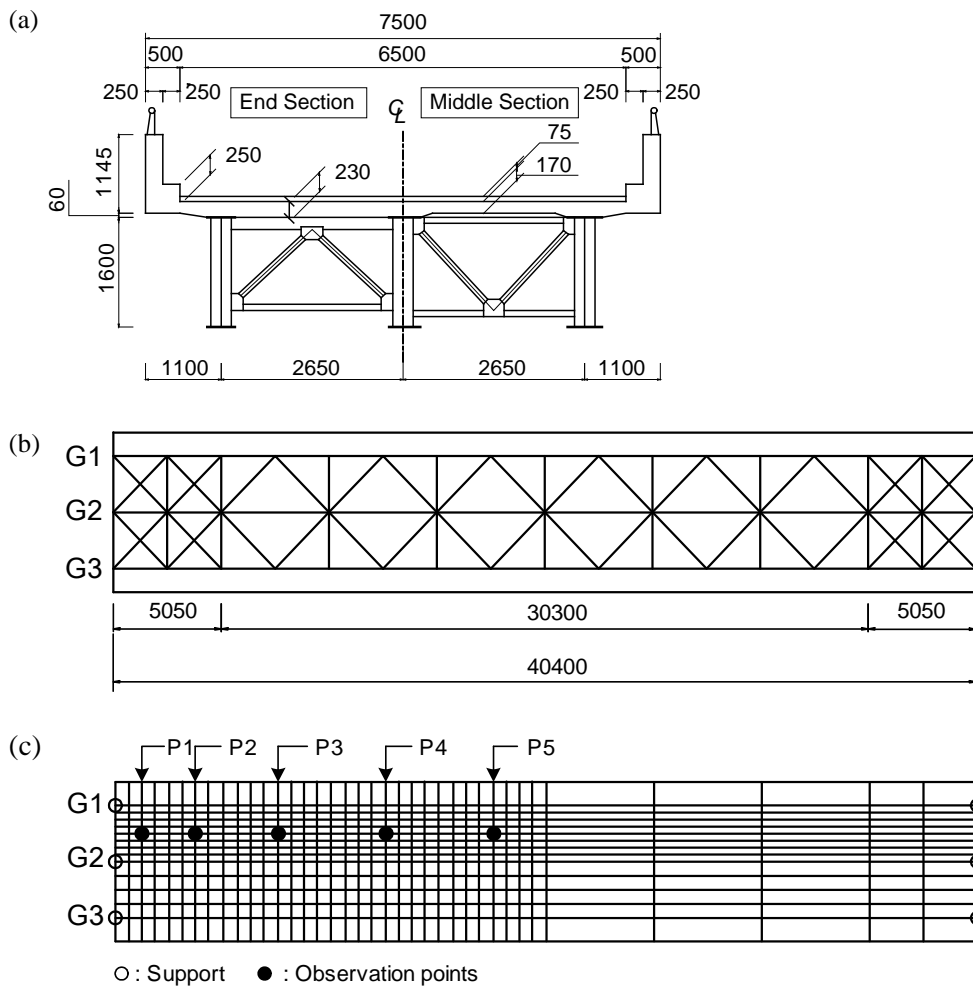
Simply supported steel plate girder bridge with RC deck (unit: mm). (a) Cross sectional view, (b) Plan view, (c) FE model.
